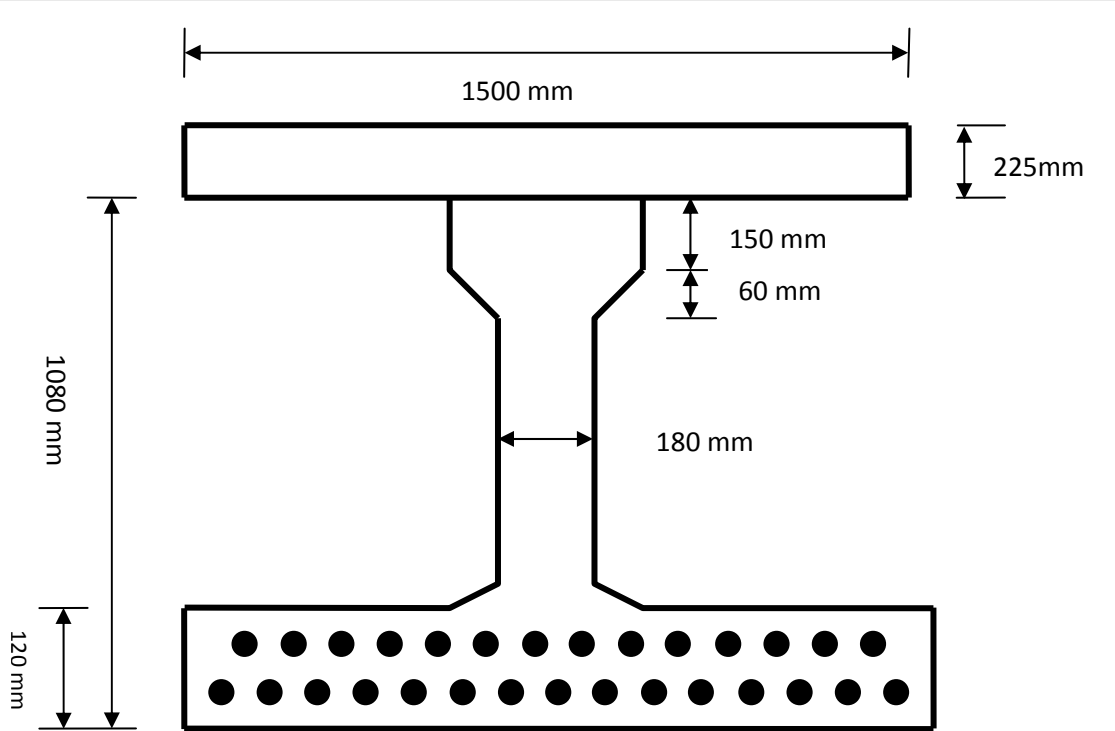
(a) Cross-section of composite bridge deck at quarter-span.
